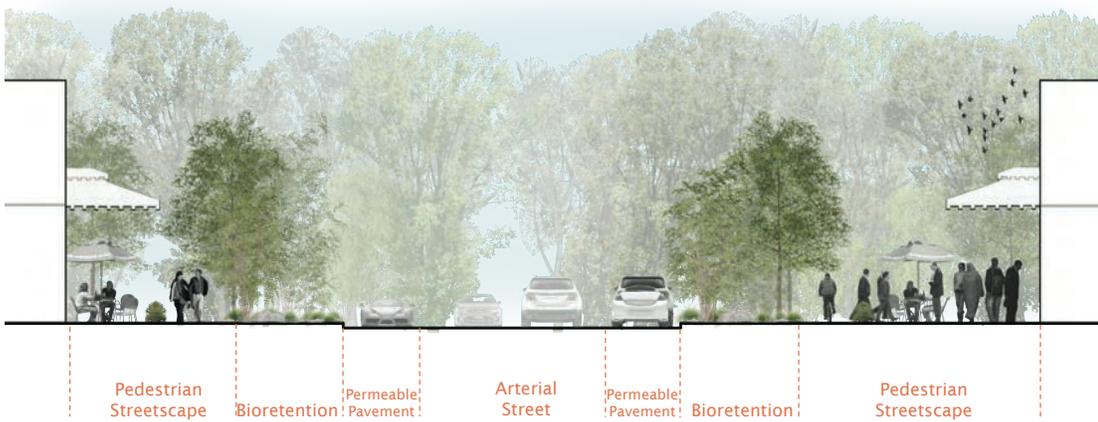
Streetscape –Arterial Street - College Avenue Enhancements (Nancy Britt).
